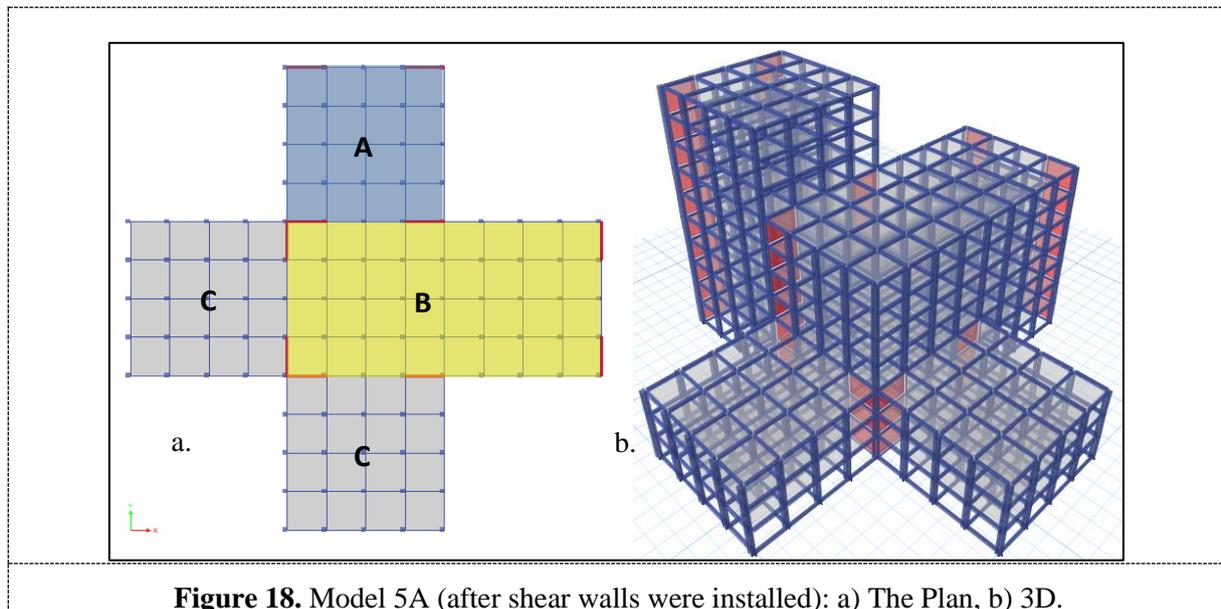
Model 5A (after shear walls were installed): a) The Plan, b) 3D.
